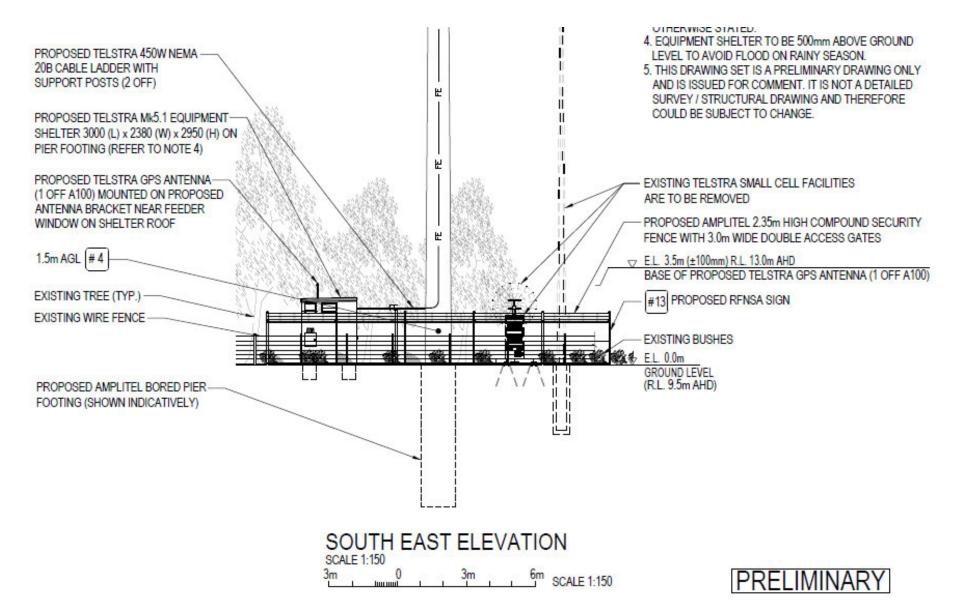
Proposed development elevation (source: DWG No. NSW100010 Issue 1 dd 03/08/23, Sheet S3)
